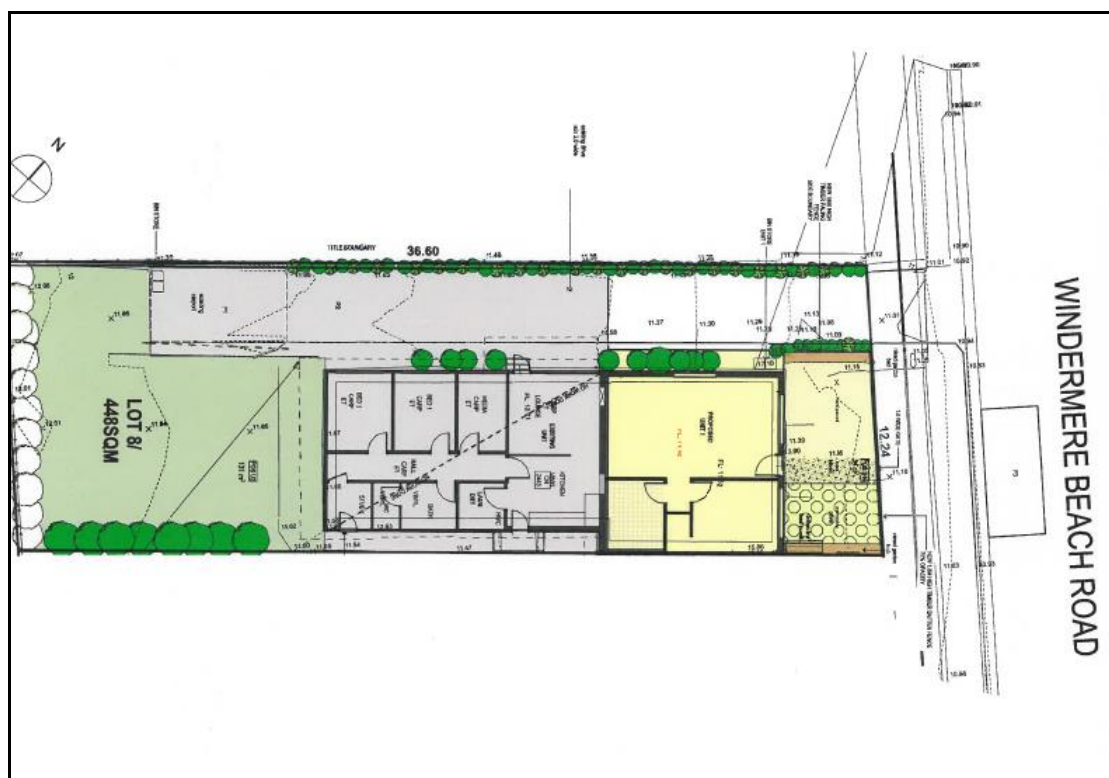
Layout of proposed multiple dwellings –Cykel Architecture
